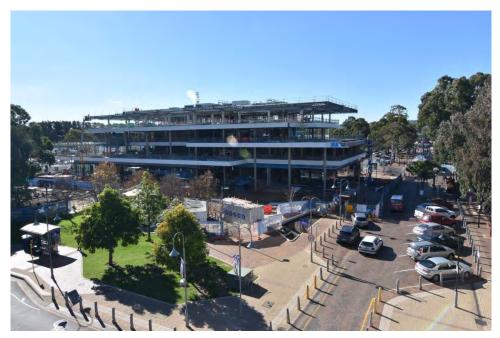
Roof Plant Slab upstands complete, Steel Roof Structure complete, Formwork stripping complete, Slab Edge fascia cladding and Ground Floor Glazing (Photo: 7 June 2019)
